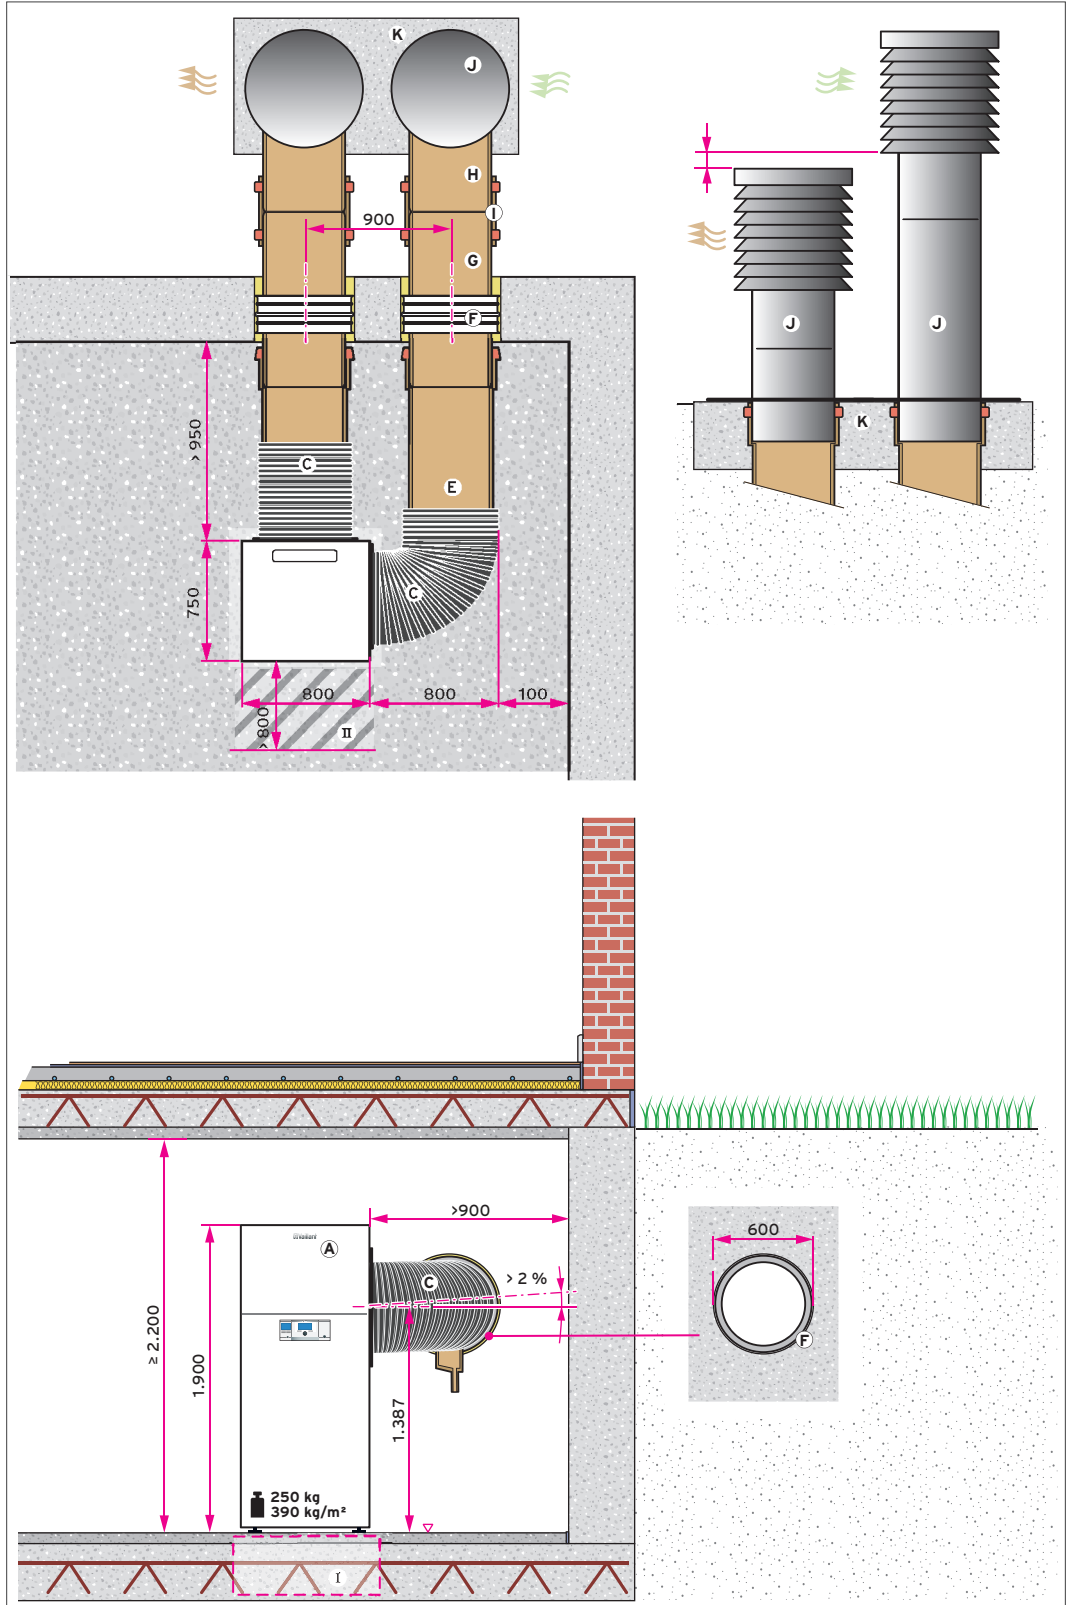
versoTHERM installation situation, cellar - single-wall installation with air-duct system manufactured by Rehau
